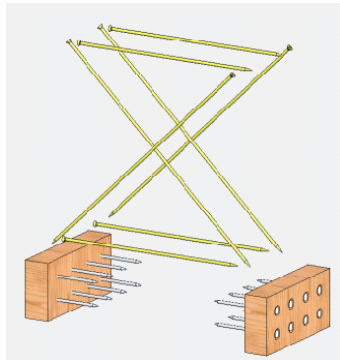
SPAX screw reinforced beam-column joint on Level 2
